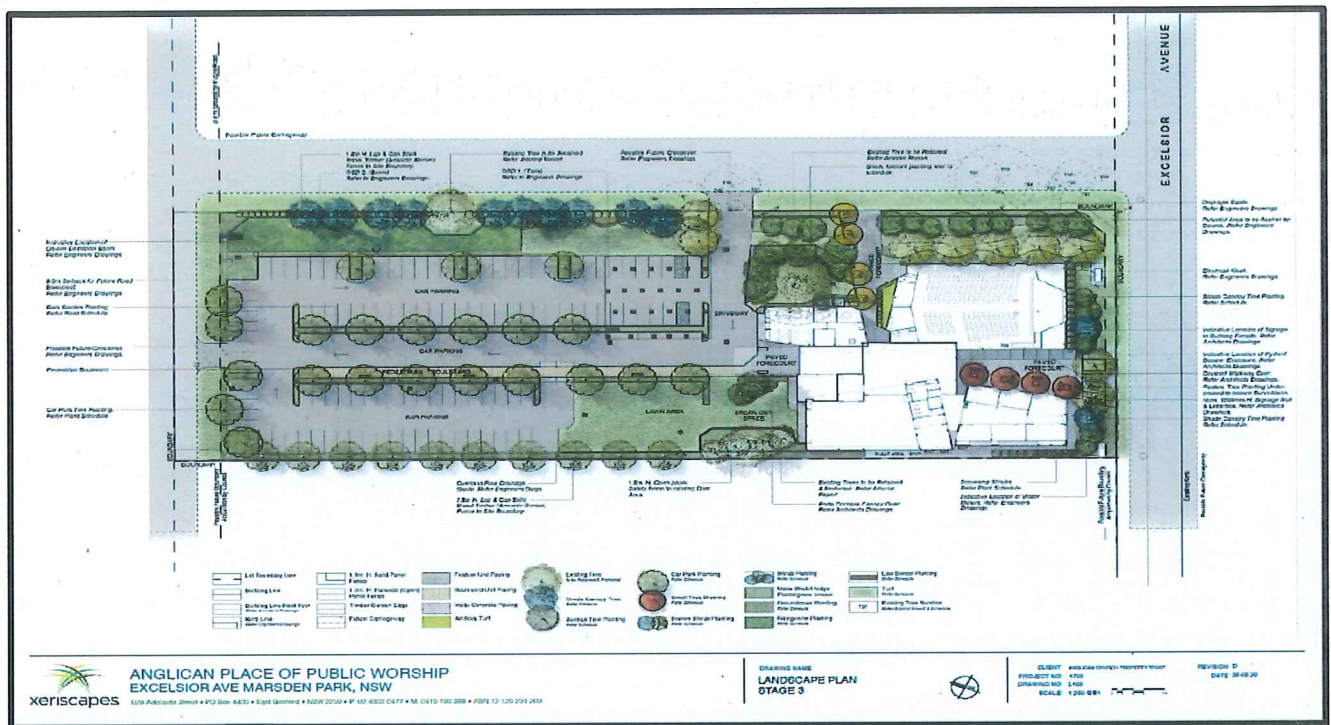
L103 Stage 3 Landscape Plan showing future driveway connections to collector road on eastern boundary and local road to northern boundary, including land acquisition. Note: the 22 m wide collector road on the eastern boundary is located fully within the neighbouring property under the draft exhibited ILP.
